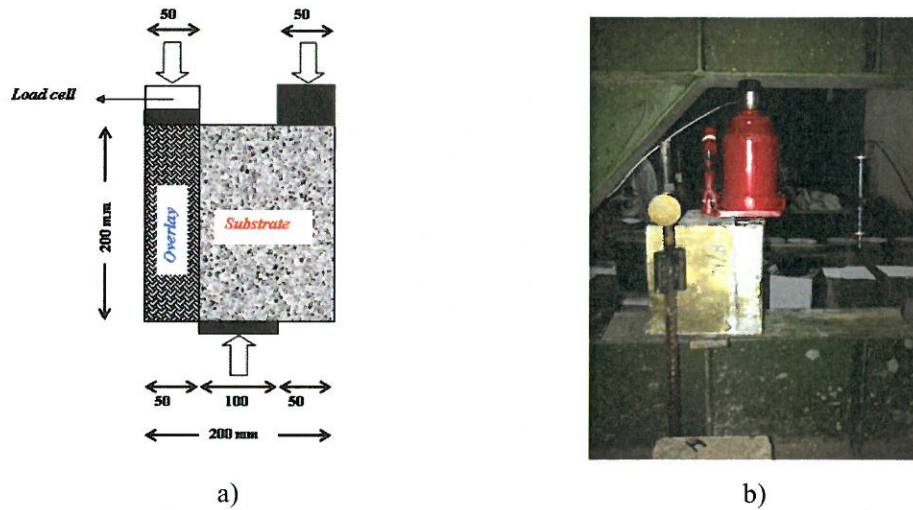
a) Dimensions of specimens, b) modified bi-surface shear test
